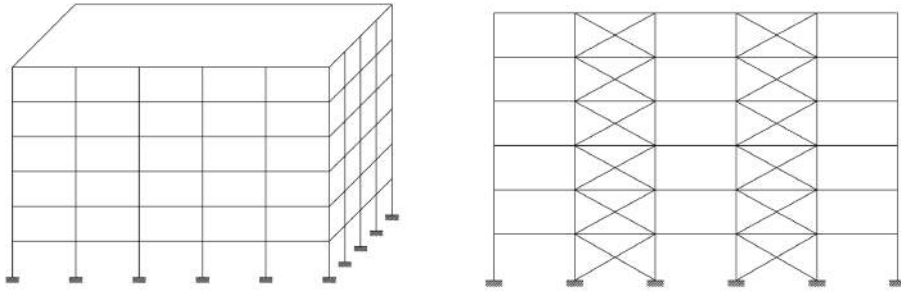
Horizontal stiffening in tall buildings: a 3D frame and a planar braced frame.
